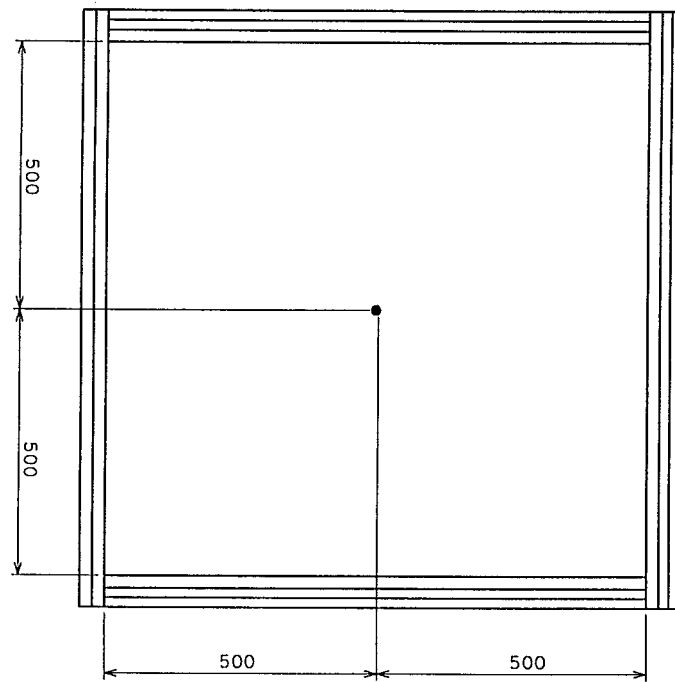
End Elevation, Placement of the Internal Thermocouples in the End Wall (mm).
